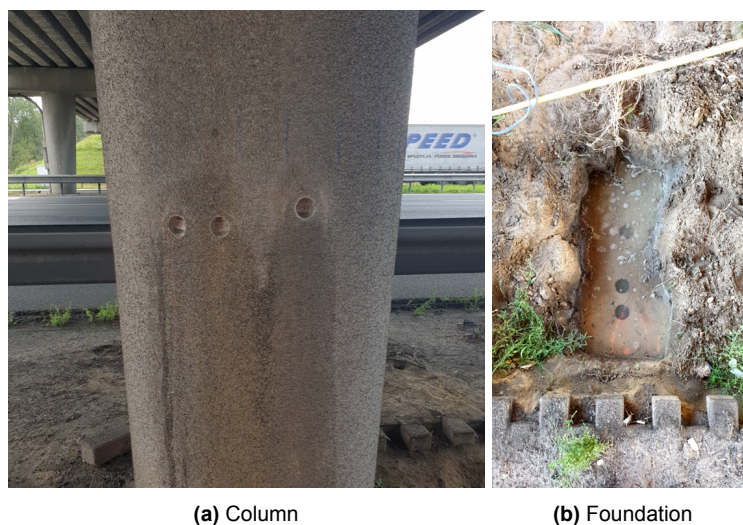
Cores extraction from columns (a) and foundation (b)
